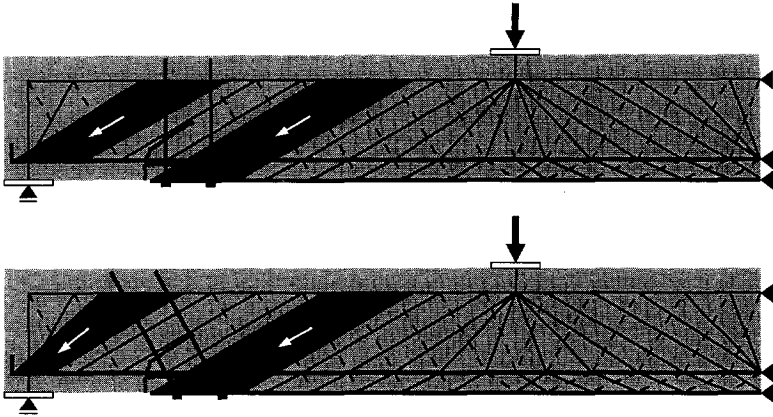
Equilibrium in truss model by virtue of two configurations of, in this case, two bolts acting as suspension reinforcement for the concrete arch activated by the externally bonded steel plate
